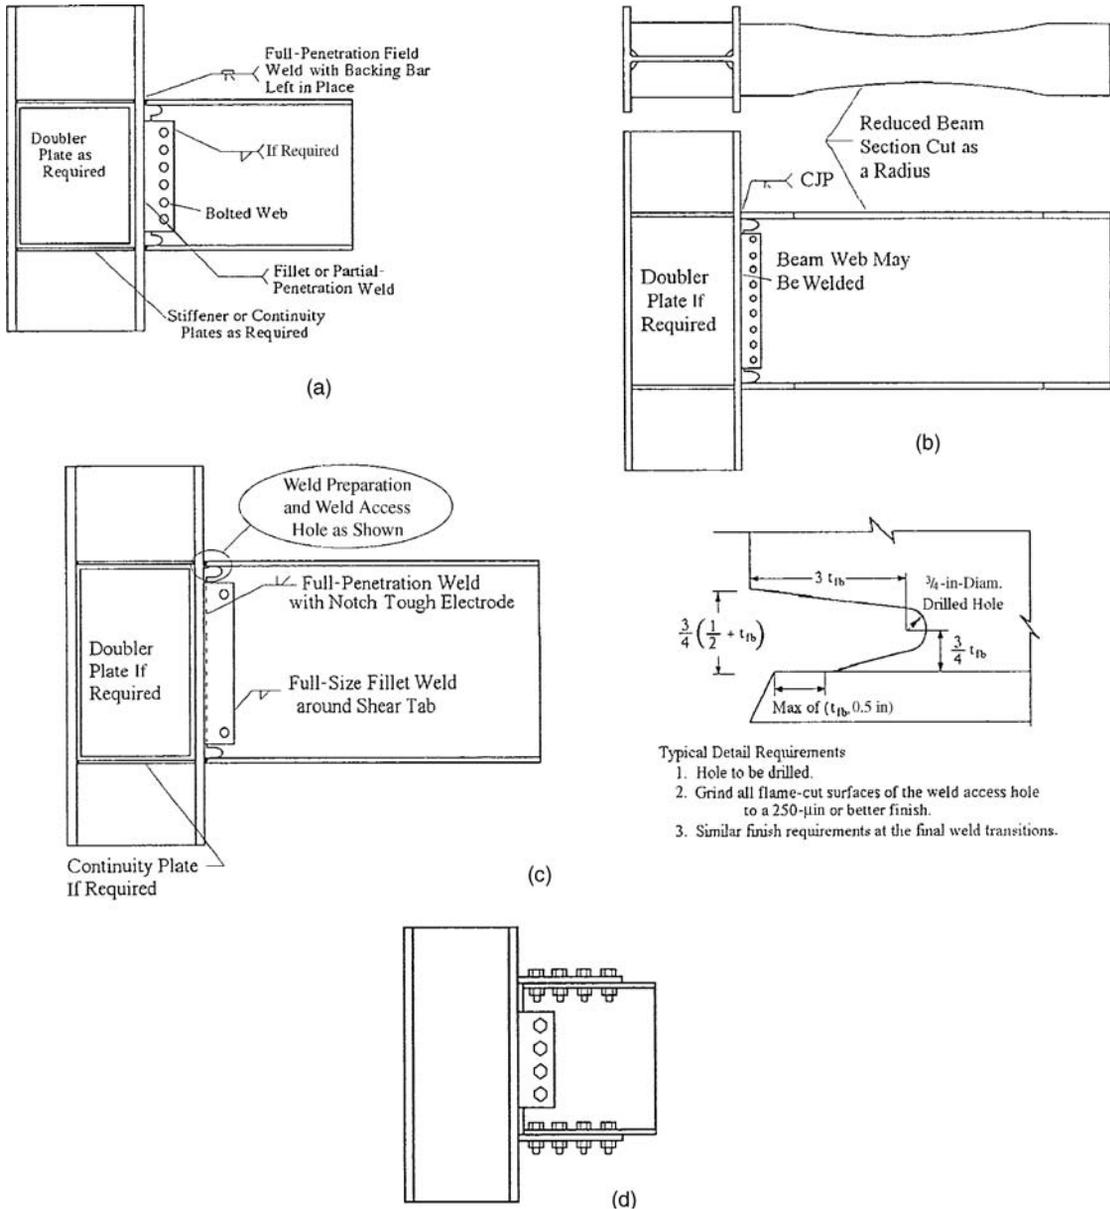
Typical connections used for moment-resisting frames. (a) Pre-Northridge welded-flange, bolted-web connection. (b) Reduced-beam-section connection. (c) Welded-flange, welded-web connection. (d) Bolted flange plate connection.
